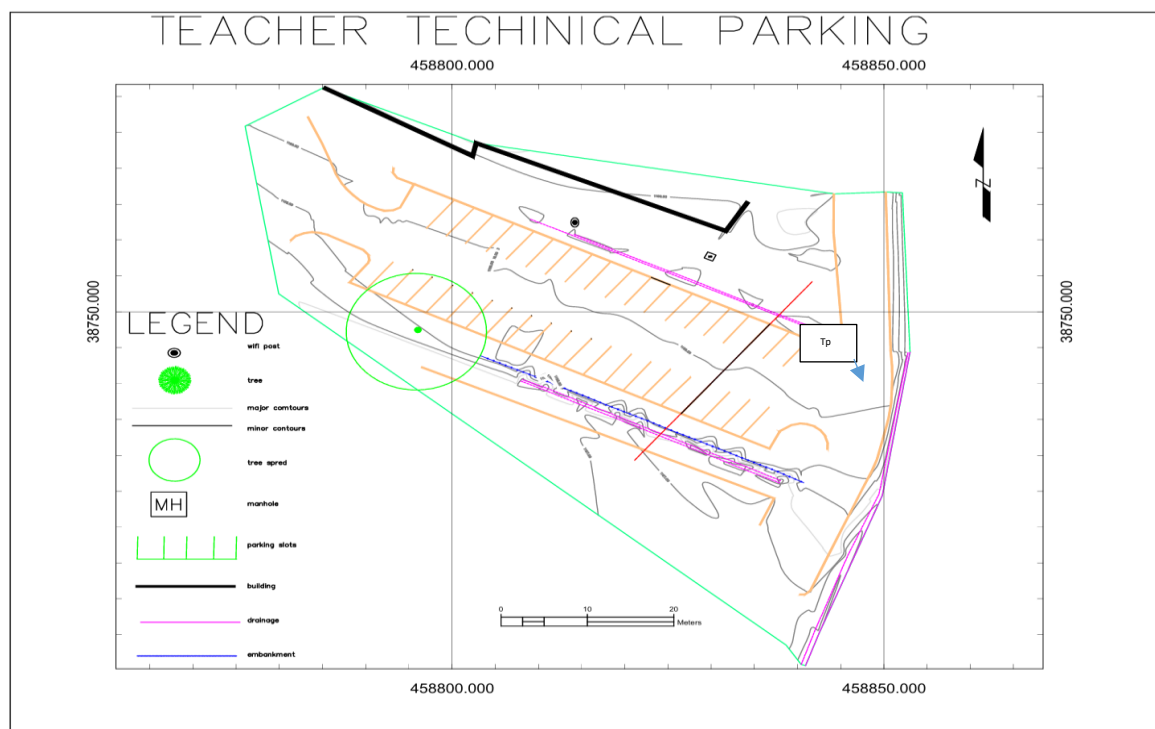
Technical Teacher Education Parking Developed using Auto Cad
